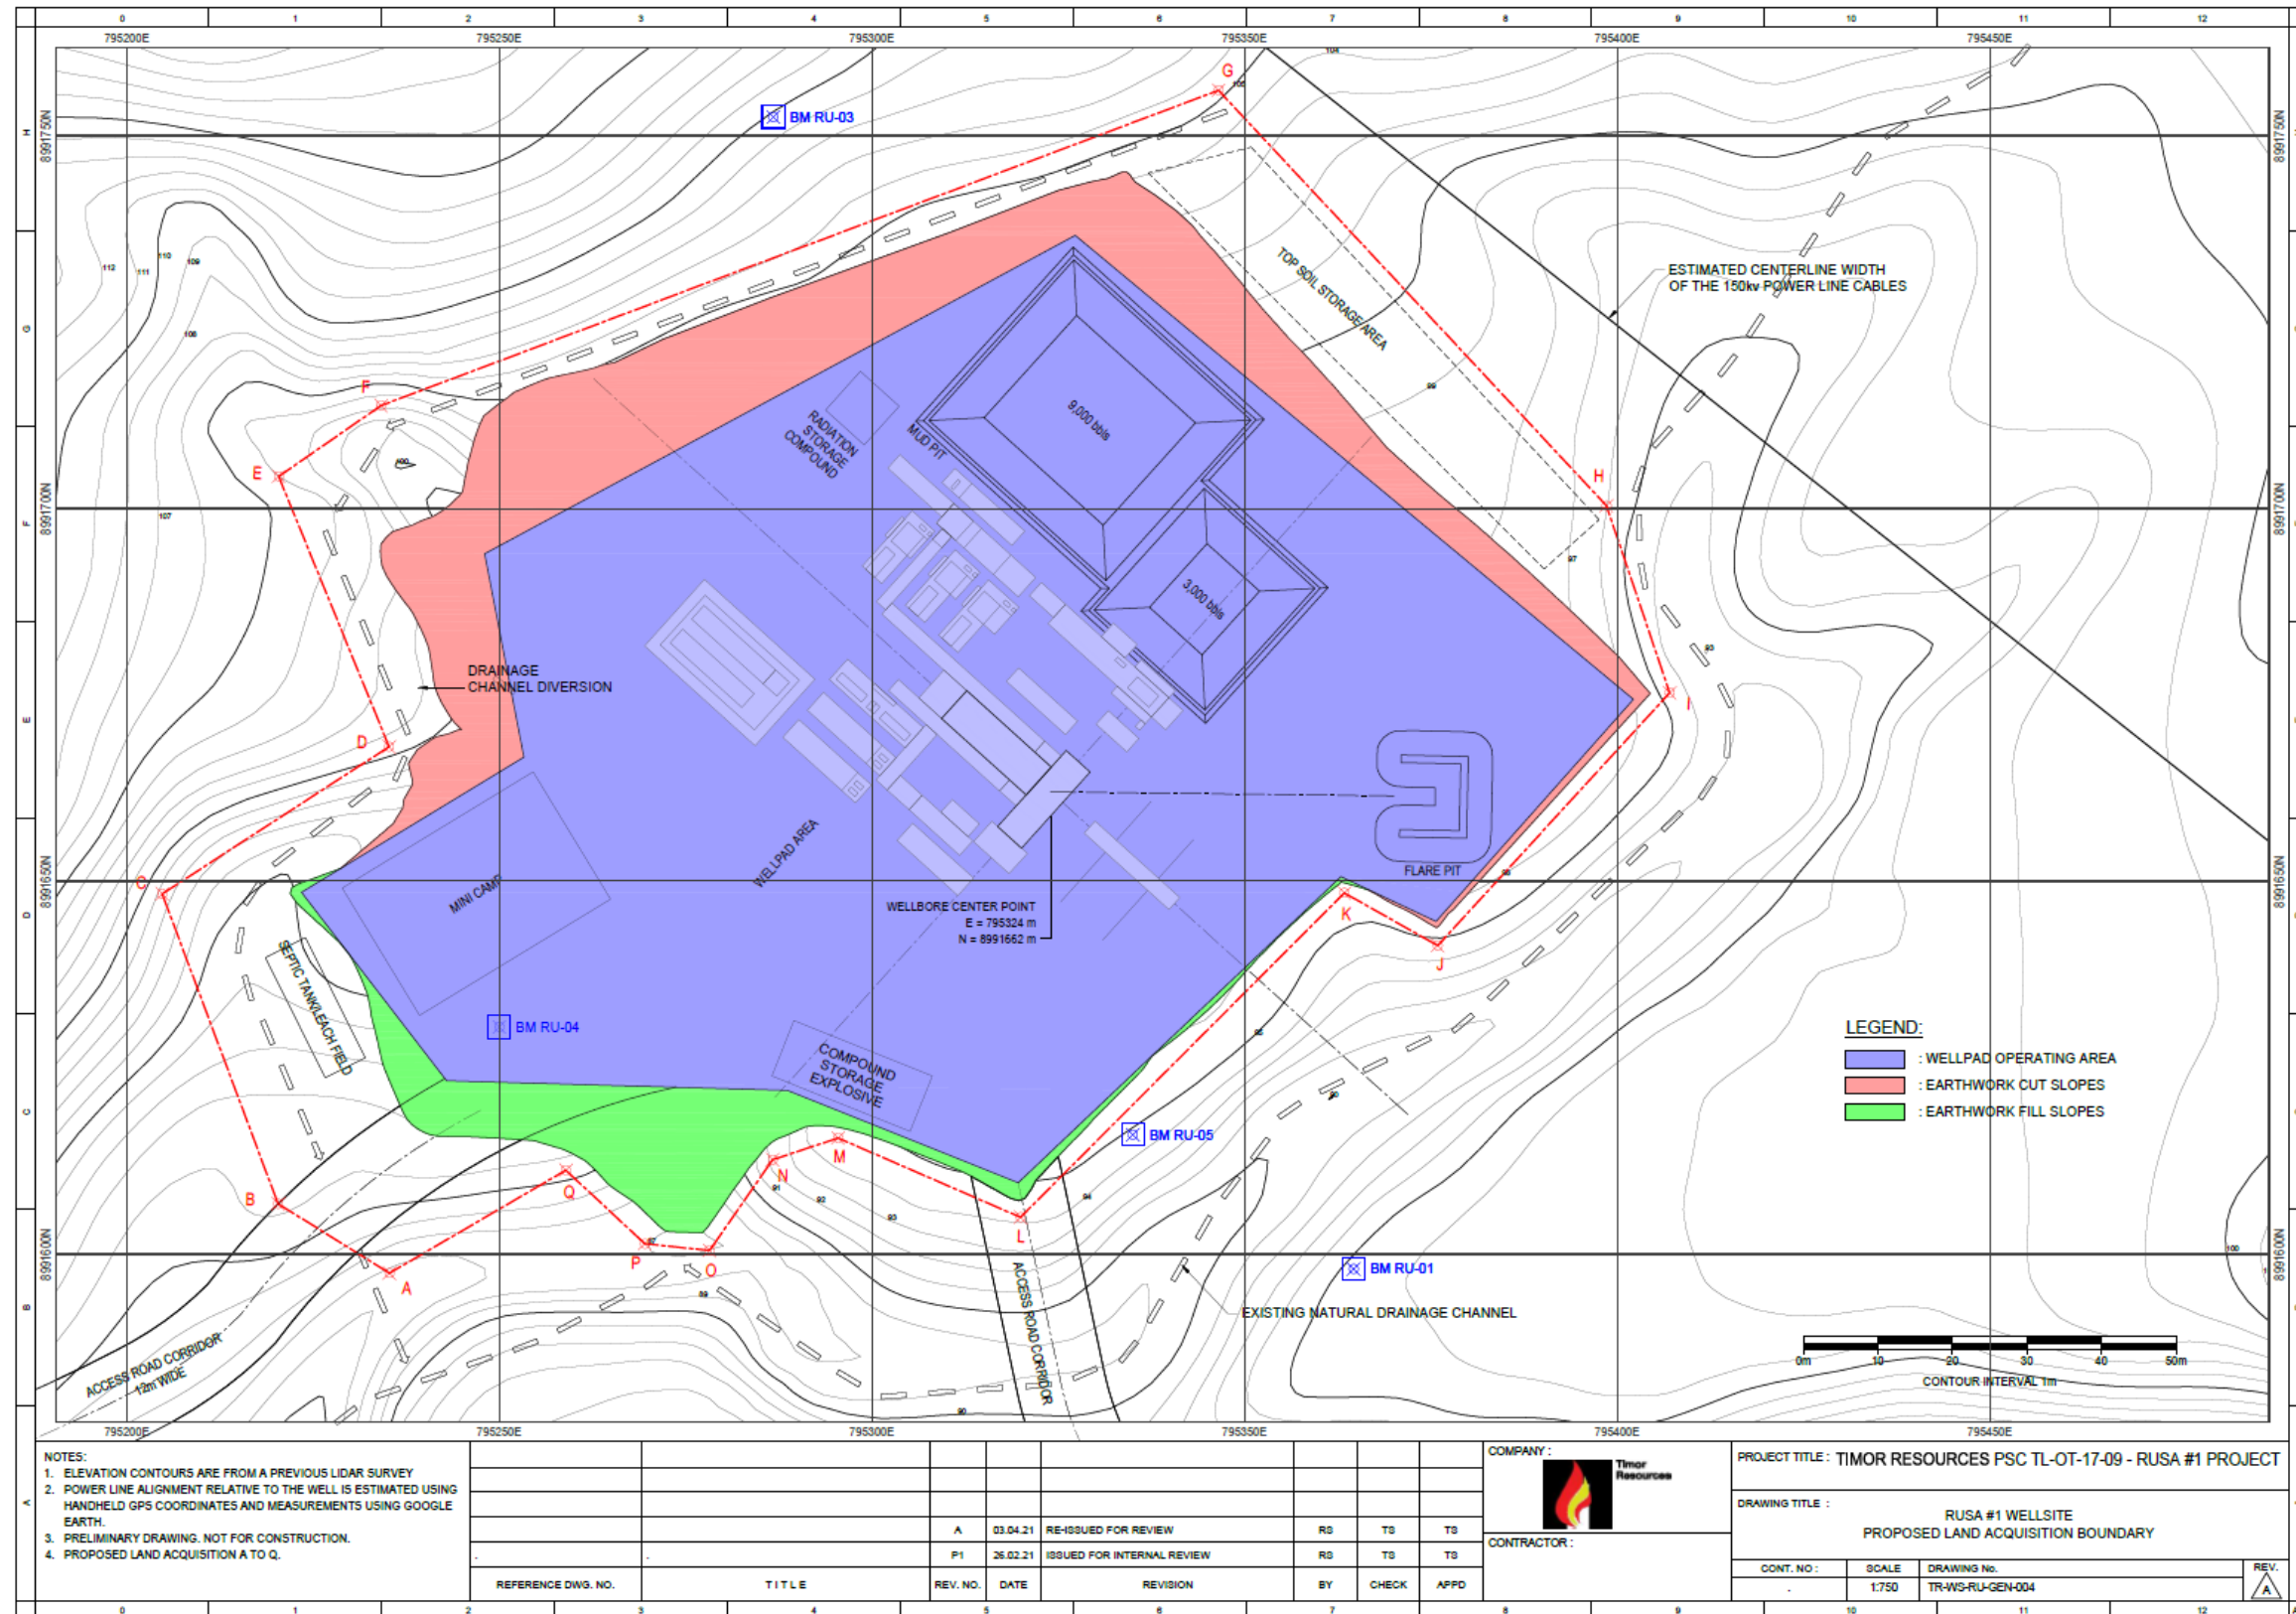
Rusa-1well layout. Subject to further surveying, civil engineering and design.
